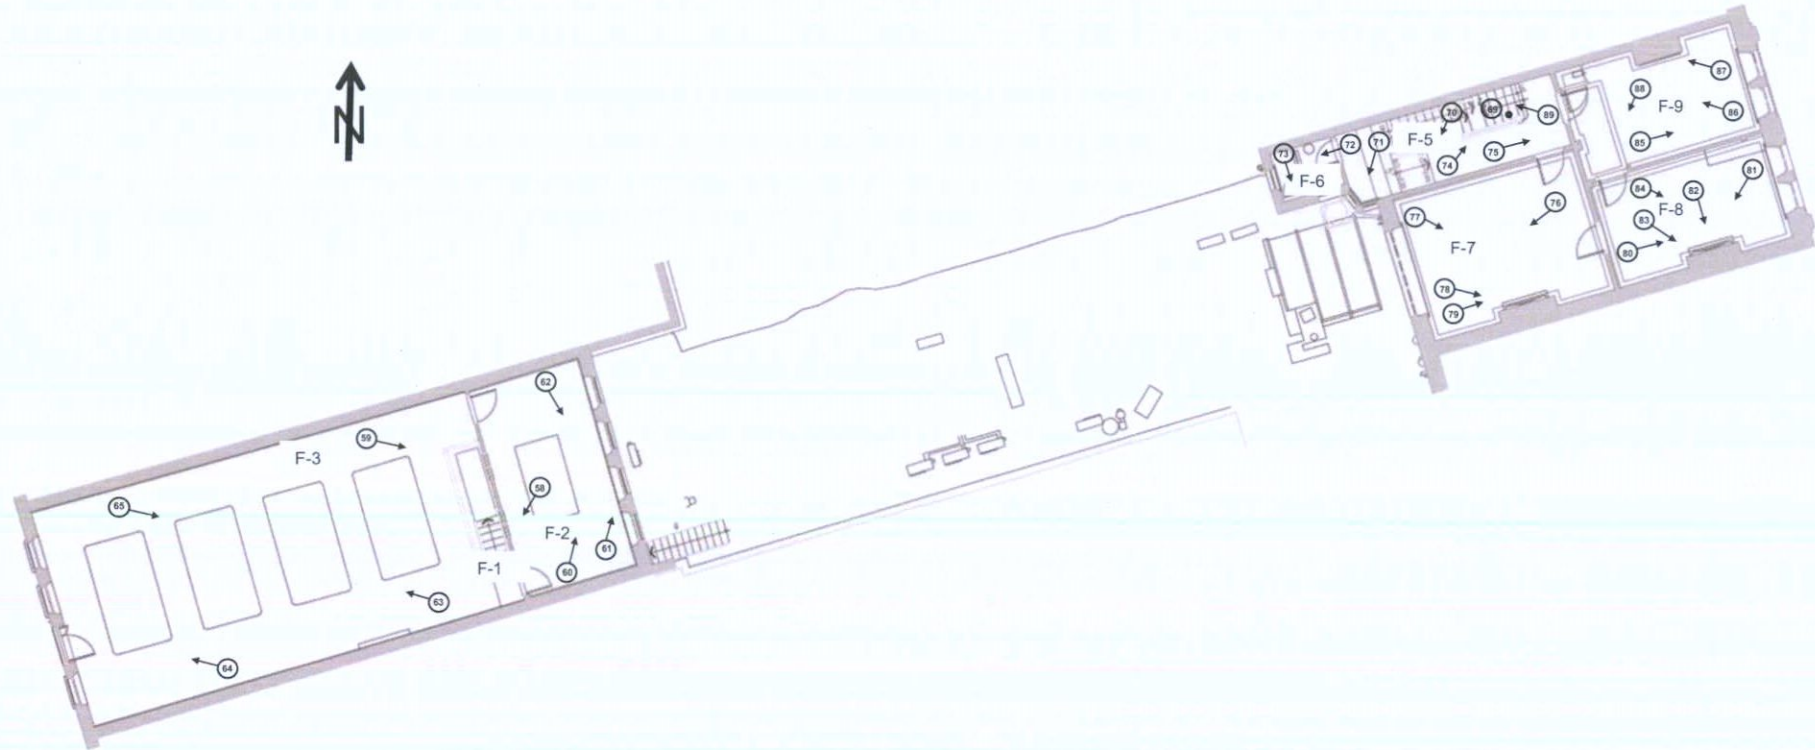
Plan at first floor level (note: F-4 is the ground-floor entrance to the first floor – see figure 6 above)
